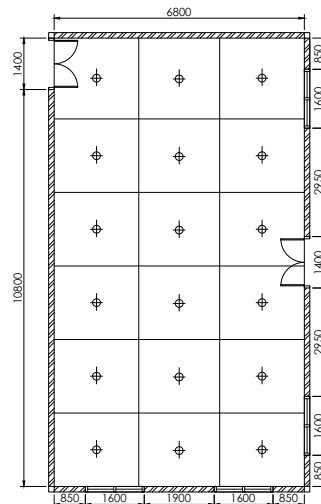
Proposed Ceiling Lighting Plan for Class X-7 St. Louis High School
